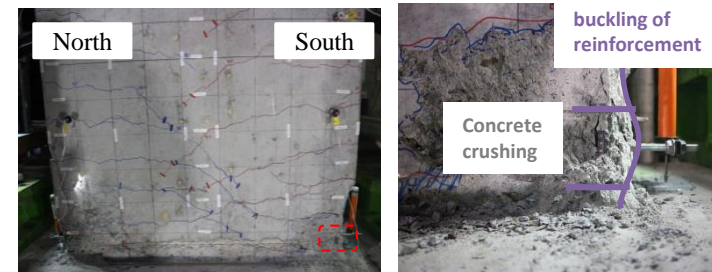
Damage of N20A including concrete crushing and rebar buckling
